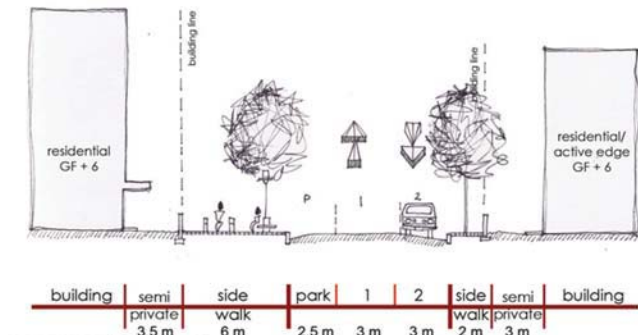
Minnaar Street provides the study area with a unique street section, with integrated street furniture and lighting as well as traffic calming methods heading east towards Burgers Park
